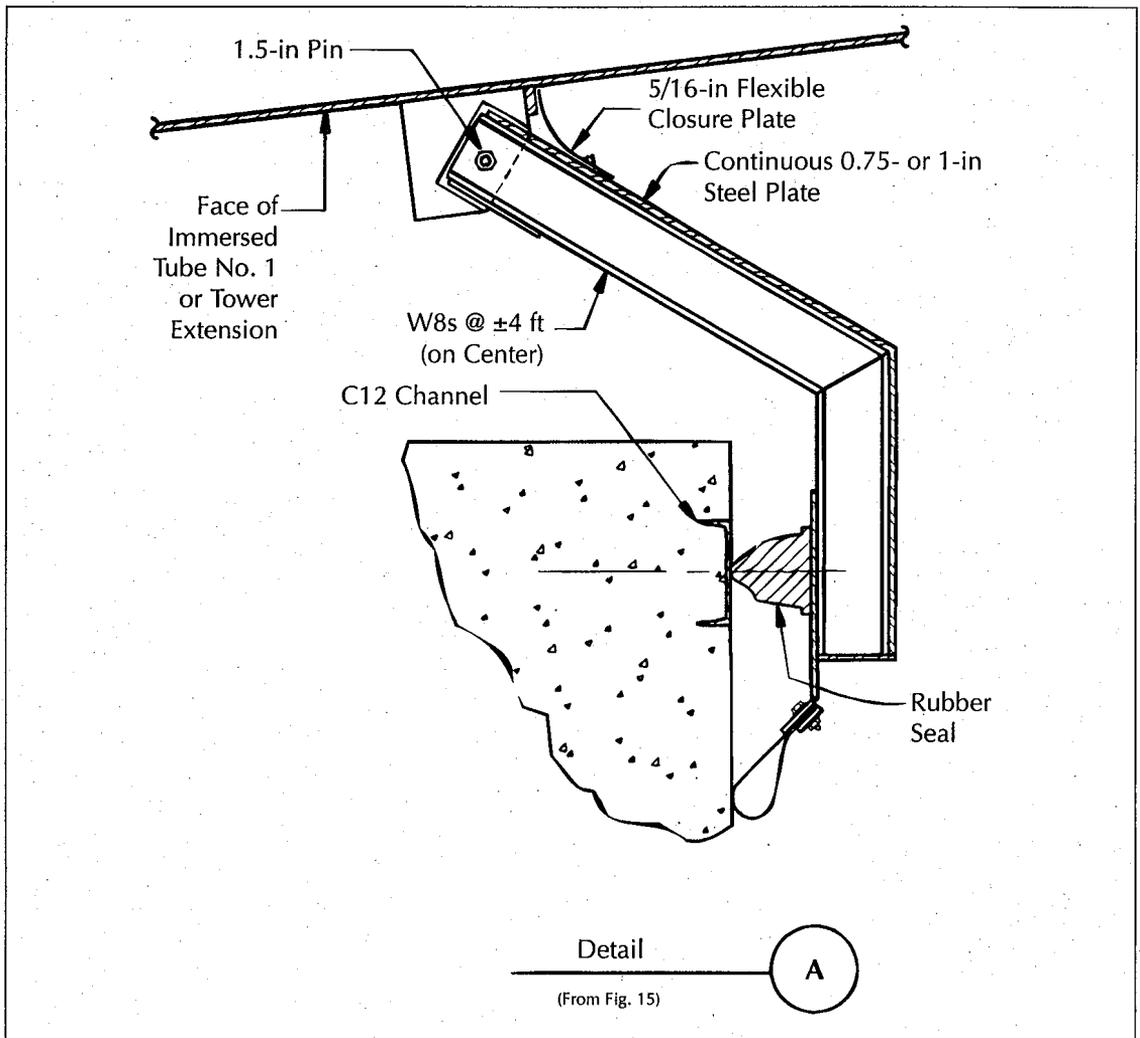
Secondary cofferdam – plan detail A of the hinged gate.
